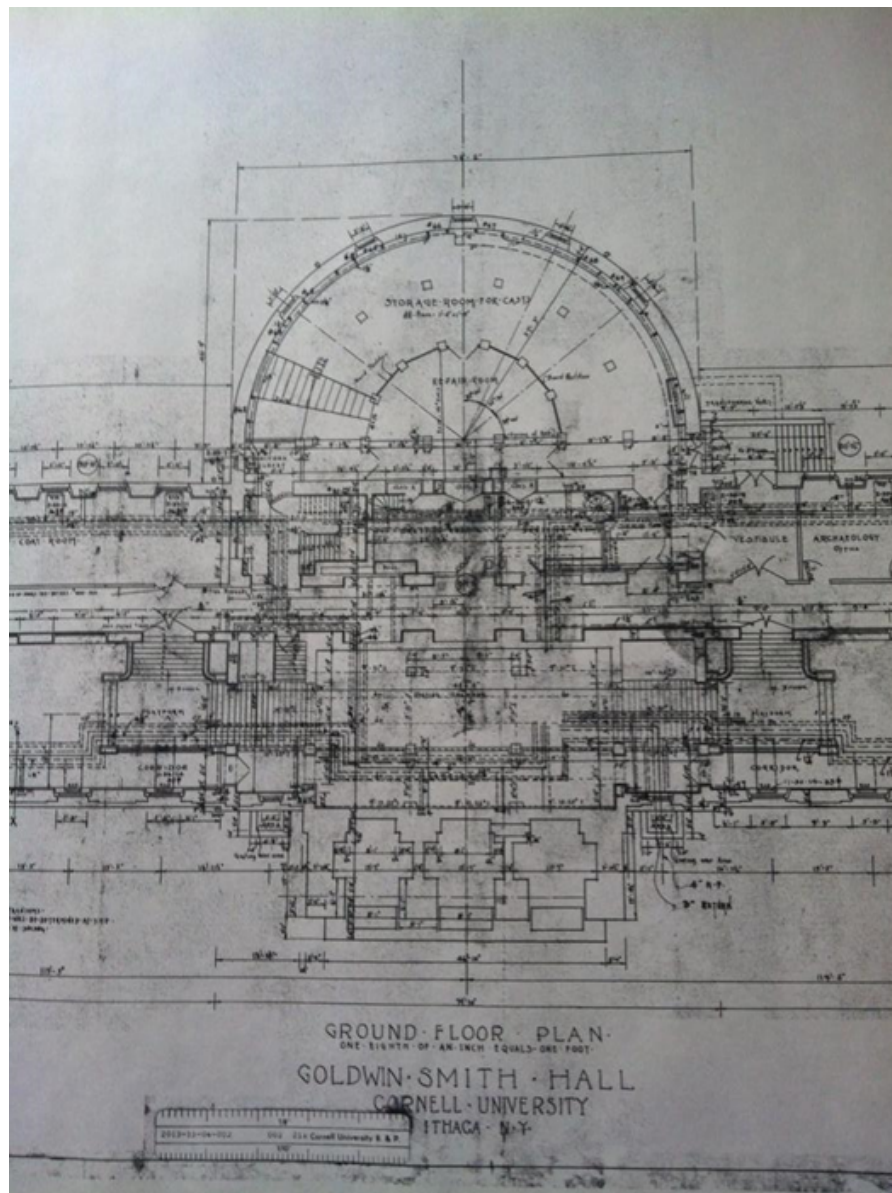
Goldwin Smith Hall Blueprint, first floor plan
